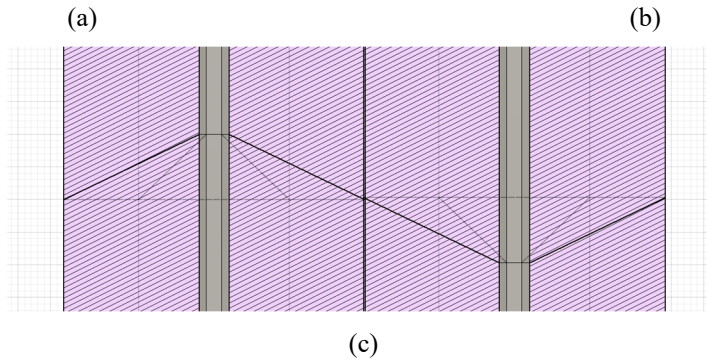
Concrete concept: (a) fitting connections, (b) stacked distribution example, and (c) connection points
